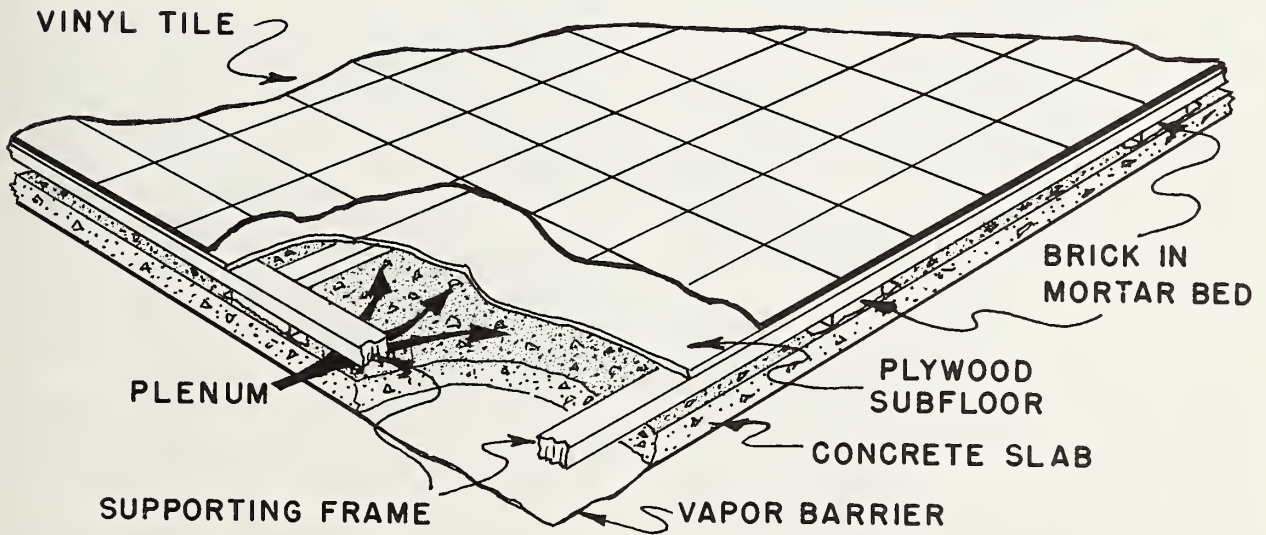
Schematic of hot-air plenum construction in addition to house D.
